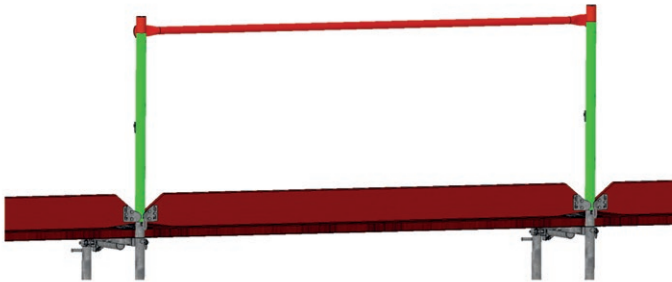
Permissible anchorage points for the personal protective equipment on the guardrail post with transom
